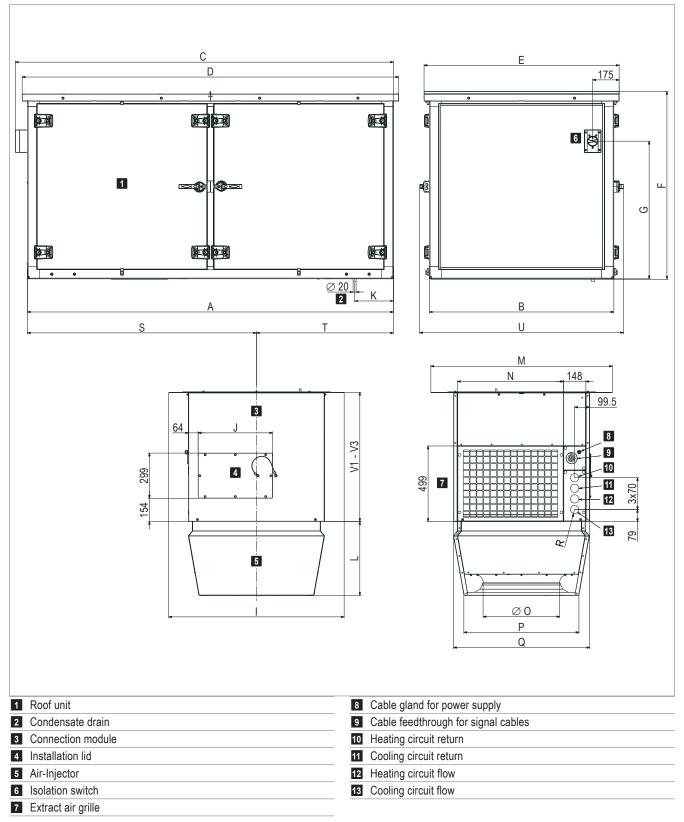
Dimensional drawing for TopVent® CHC with hydraulic assembly throttling circuit (dimensions in mm)
